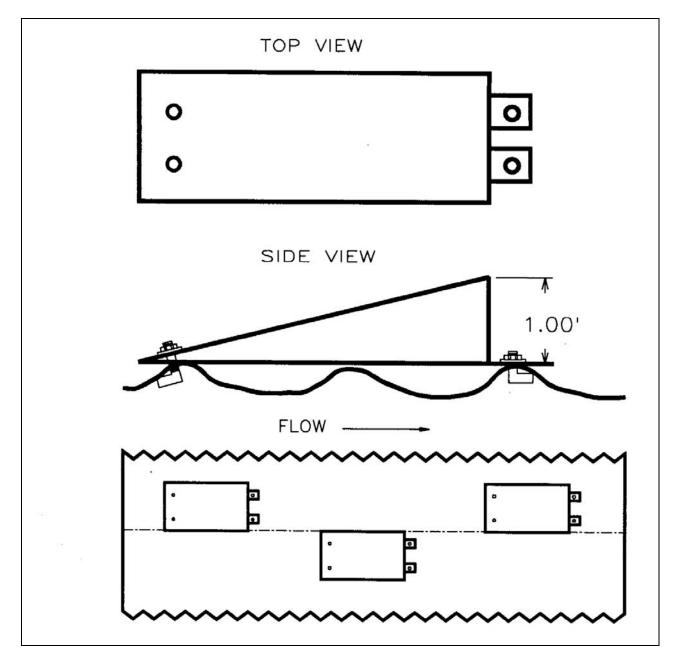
Corrugated metal pipe steel ramp baffles.
